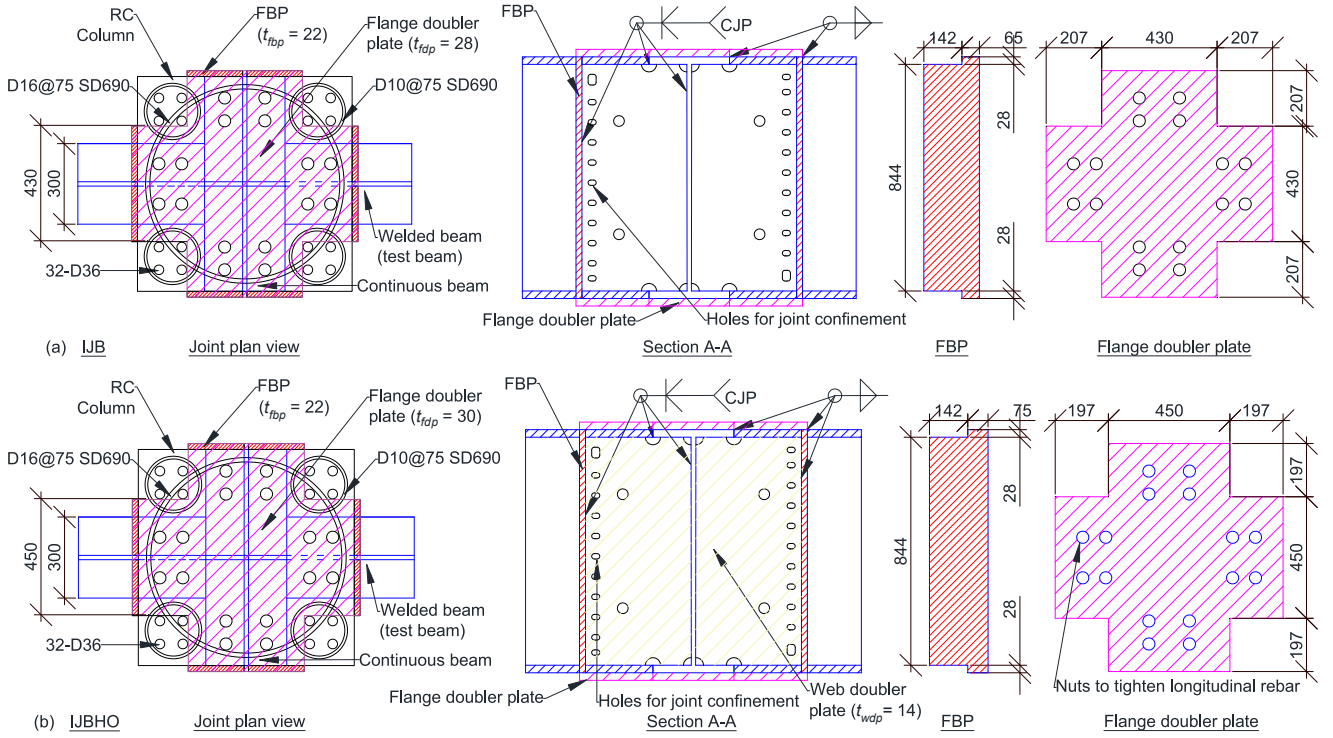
Design details of joint: a) IJB, and b) IJBHO (Unit: mm).
